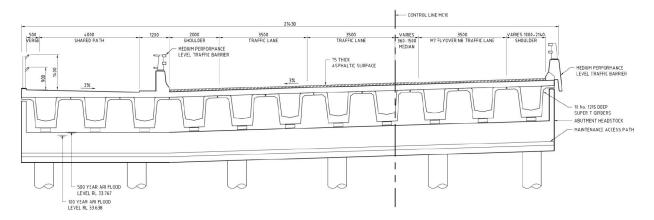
Typical cross section of the proposed Bells Creek bridge (indicative concept design)
